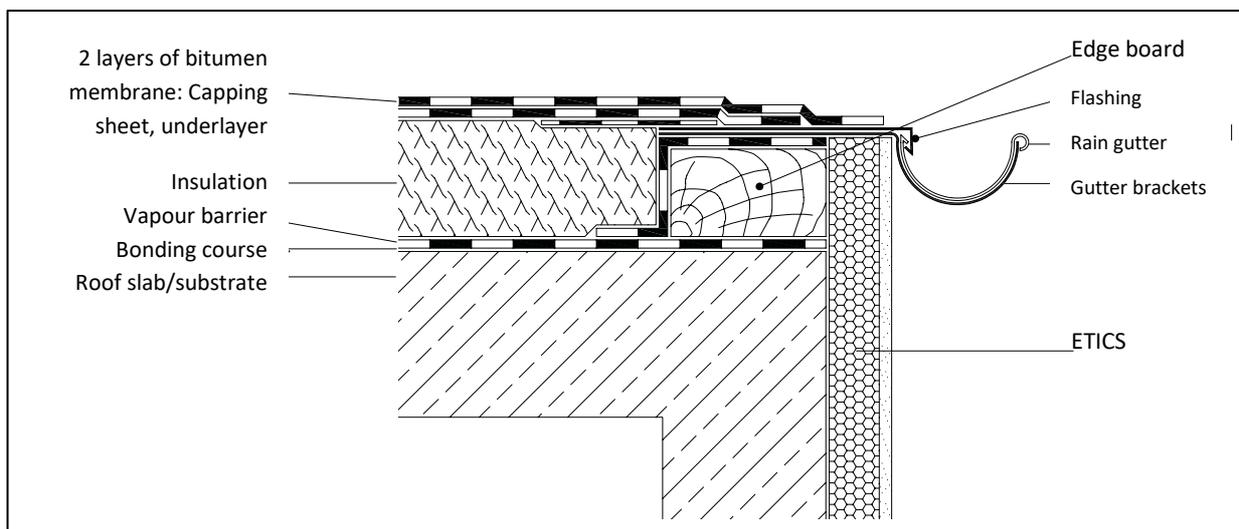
Schematic drawing of an eave construction with a wooden edge board and a hanging gutter
